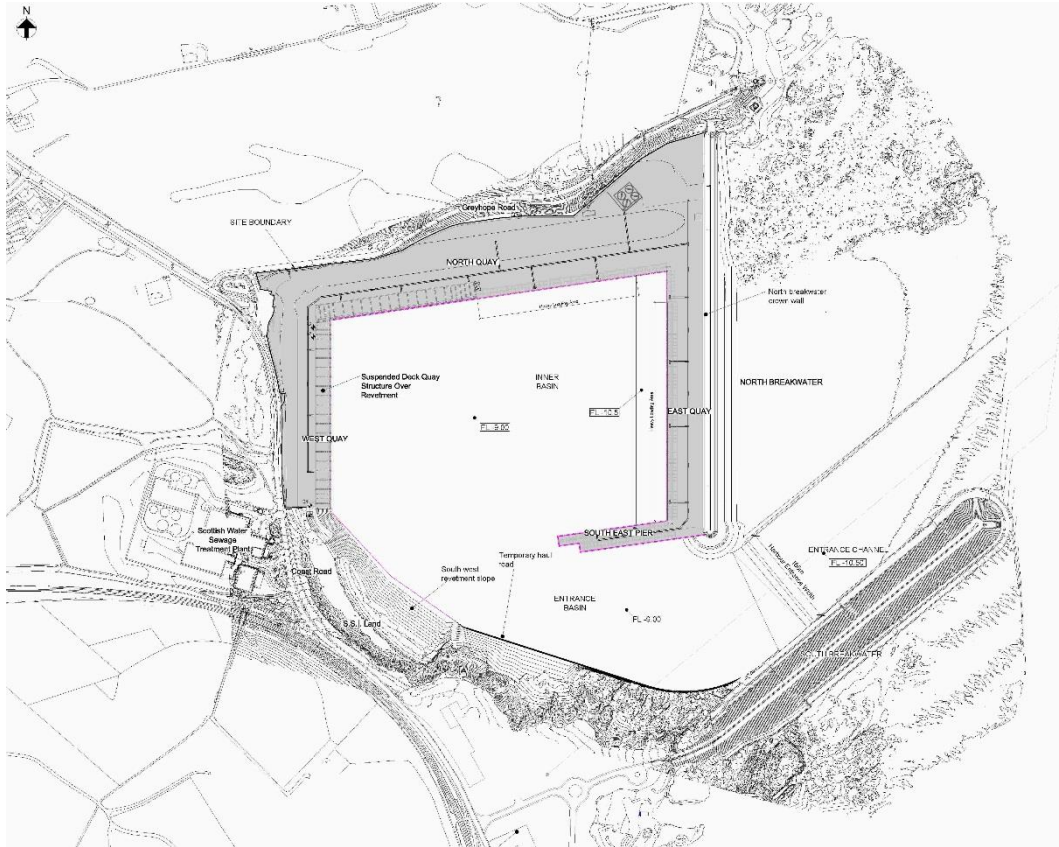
Layout of harbour showing the West and North Quay suspended decks
